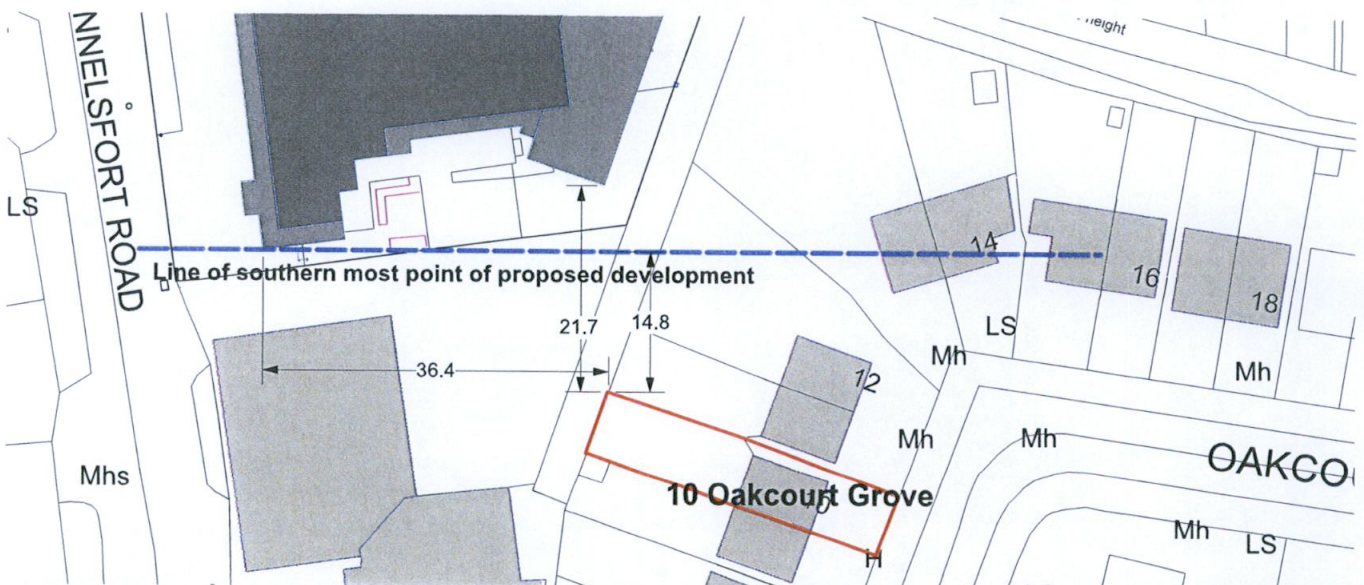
Site Plan indicating the relationship between the proposed development and No.10 Oakcourt Grove
